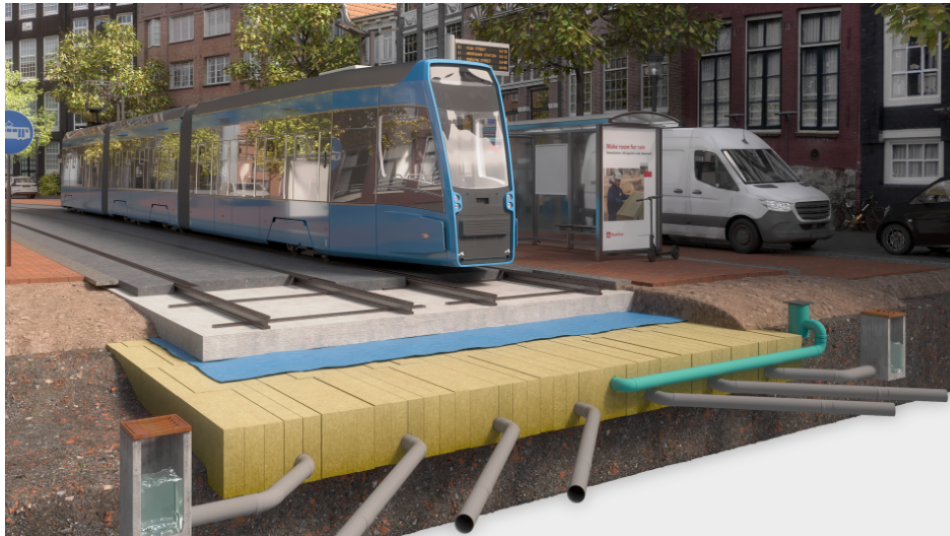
Illustration of the Rockwool elements underneath a concrete slab track structure [56]
